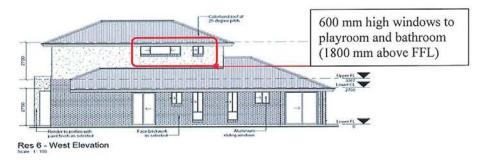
West Facing Upper Level Windows of Dwelling 6 (Dwelling 7 is Mirrored)
